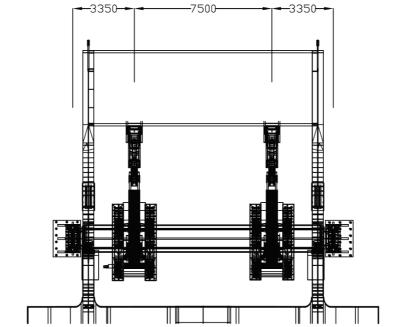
Distance between main supports and mounting points. The left bearing is fixed and right is a gliding bearing in transverse direction.
